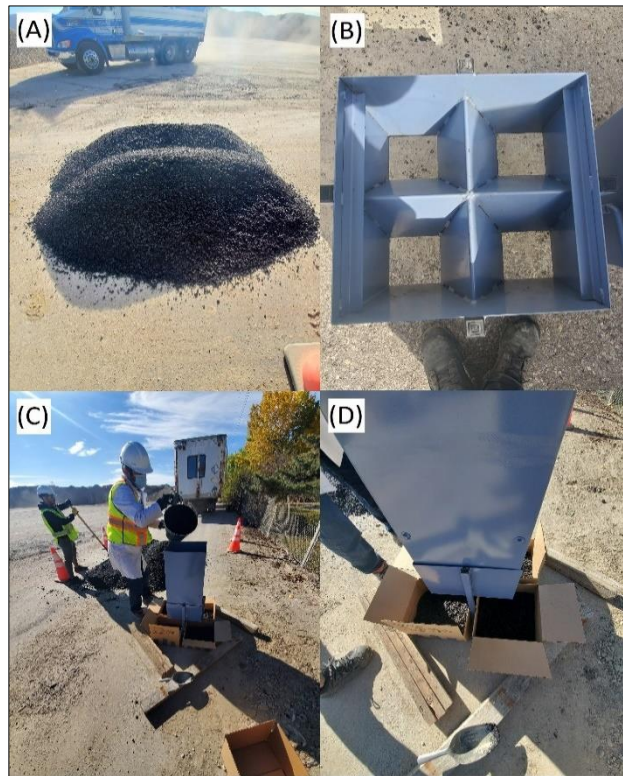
(A) Asphalt mix stockpile at HMA plant; (B) Quartermaster base unit; (C) Loading process; (D) Sample collection in the cardboard boxes
